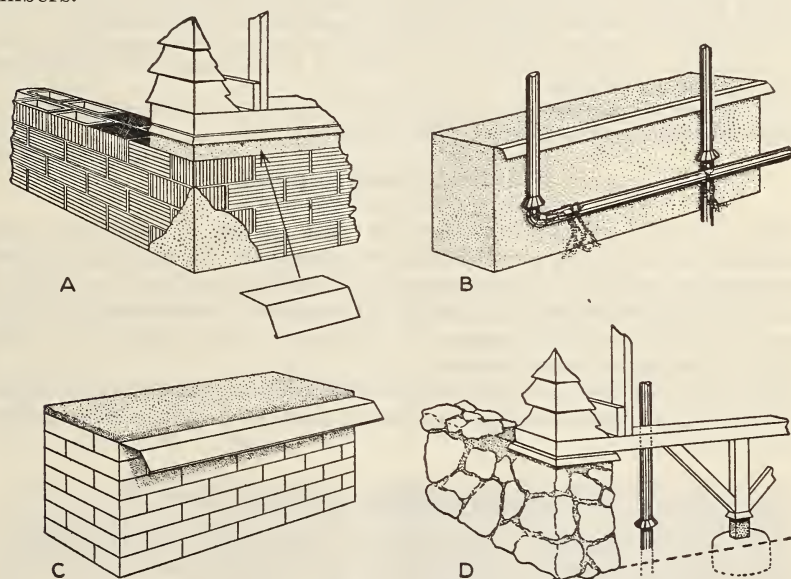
Illustrating use of metal shields in foundation walls and about piping and wooden supports
